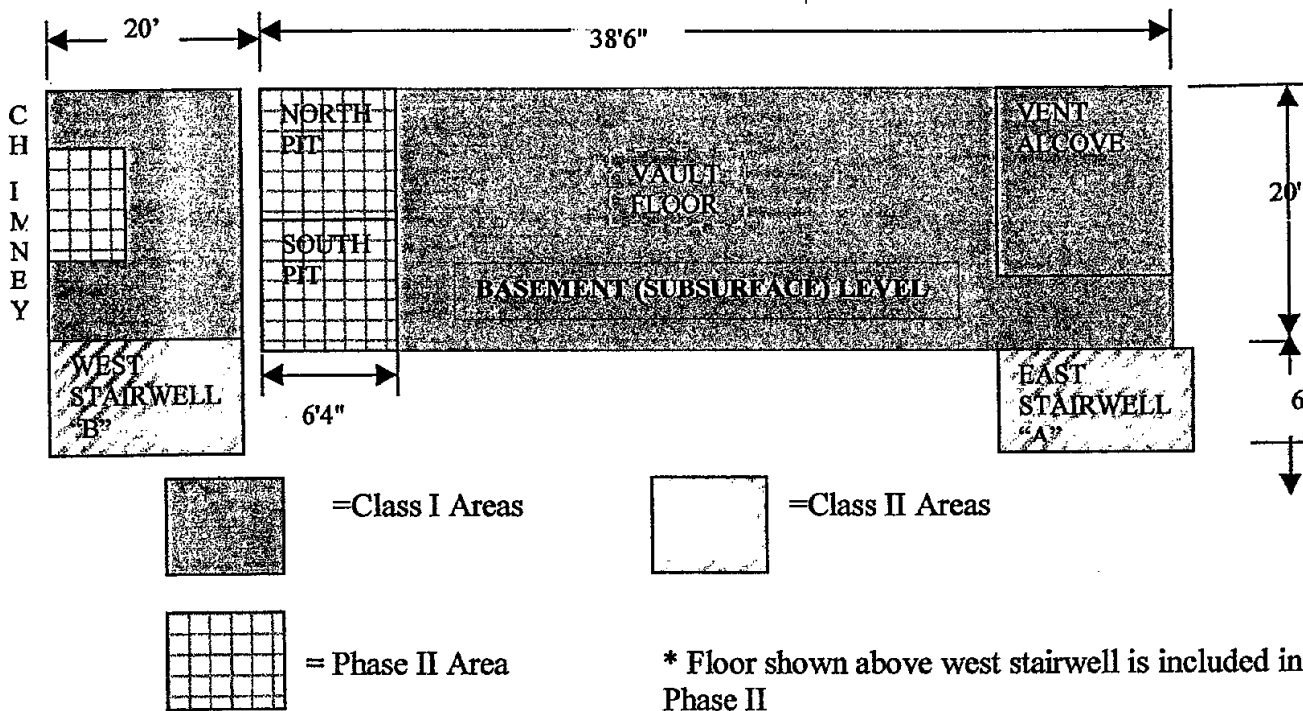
BUILDING 4059 CLASS I FLOOR PLAN (BASEMENT LEVEL)
